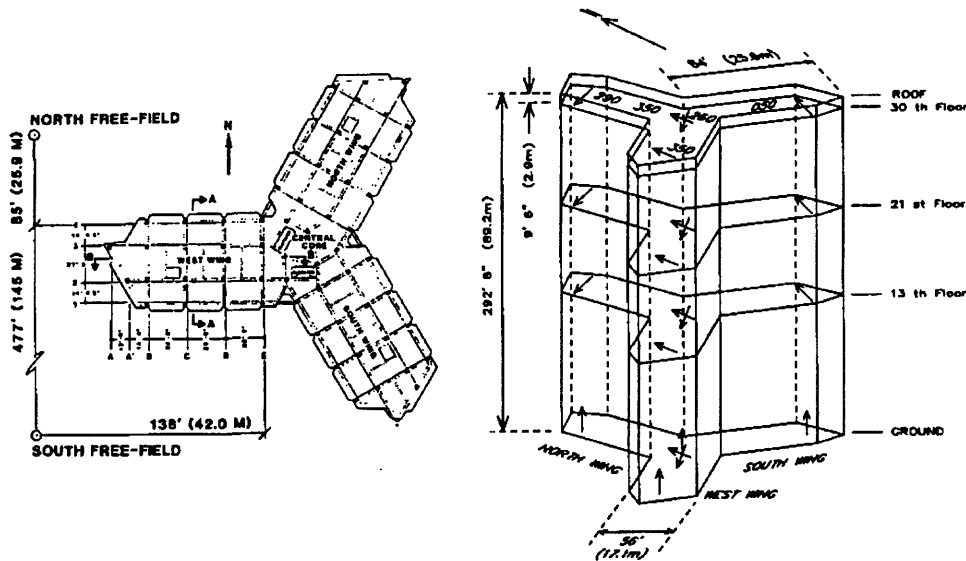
Plan layout and three-dimensional schematic and instrumentation scheme of Pacific Park Plaza (PPP), Emeryville, Ca.
